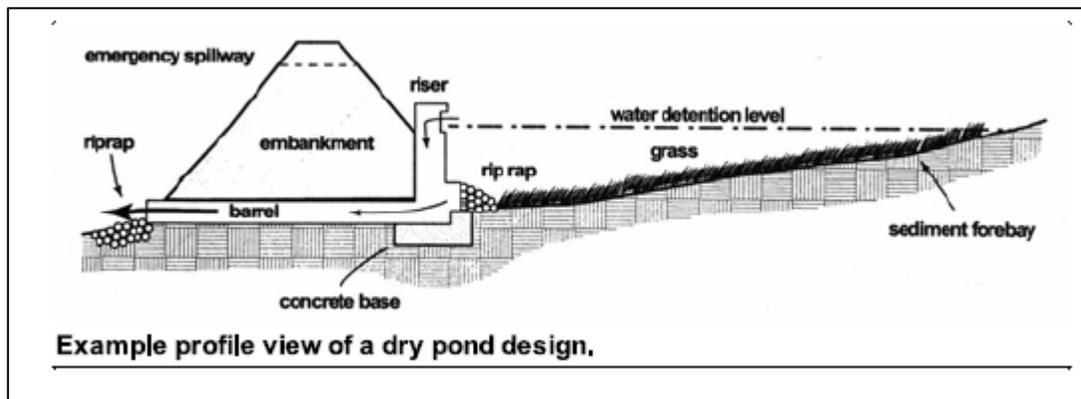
Conceptual Layout of a Dry Detention Basin
